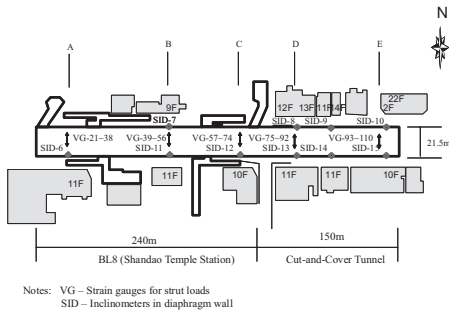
Layout of Shandao Temple Station and locations of instrumented sections.
